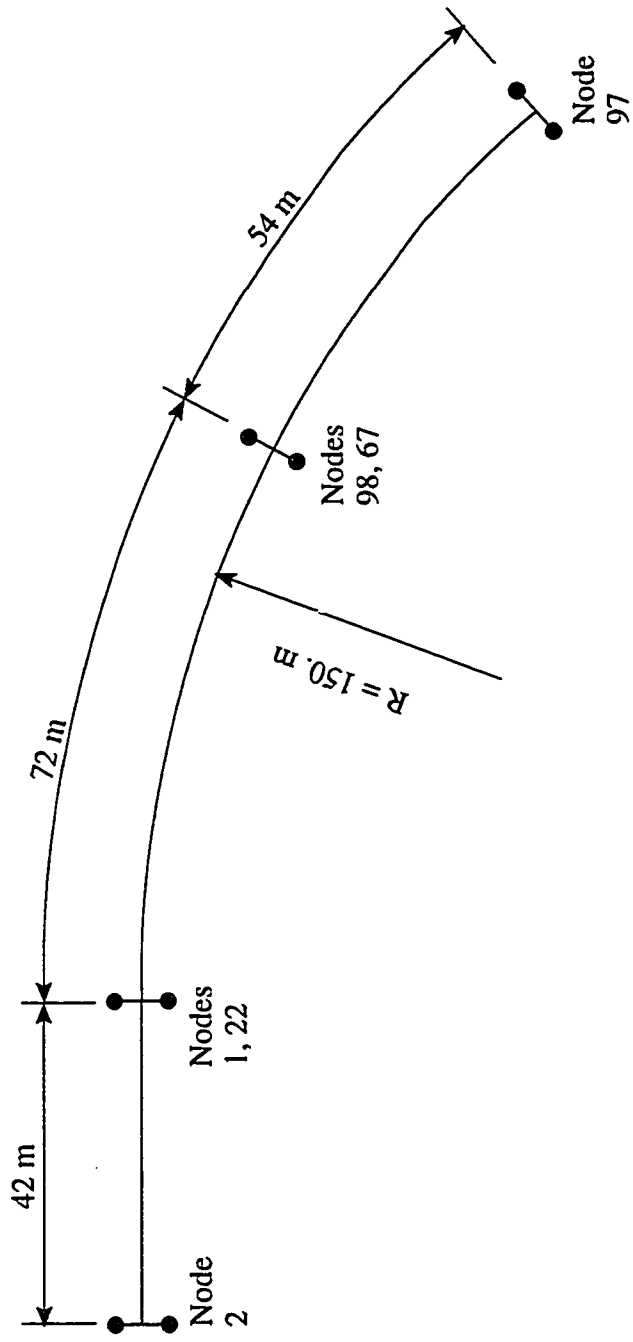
Span Arrangement of the Bridge used in the Demonstration Example
